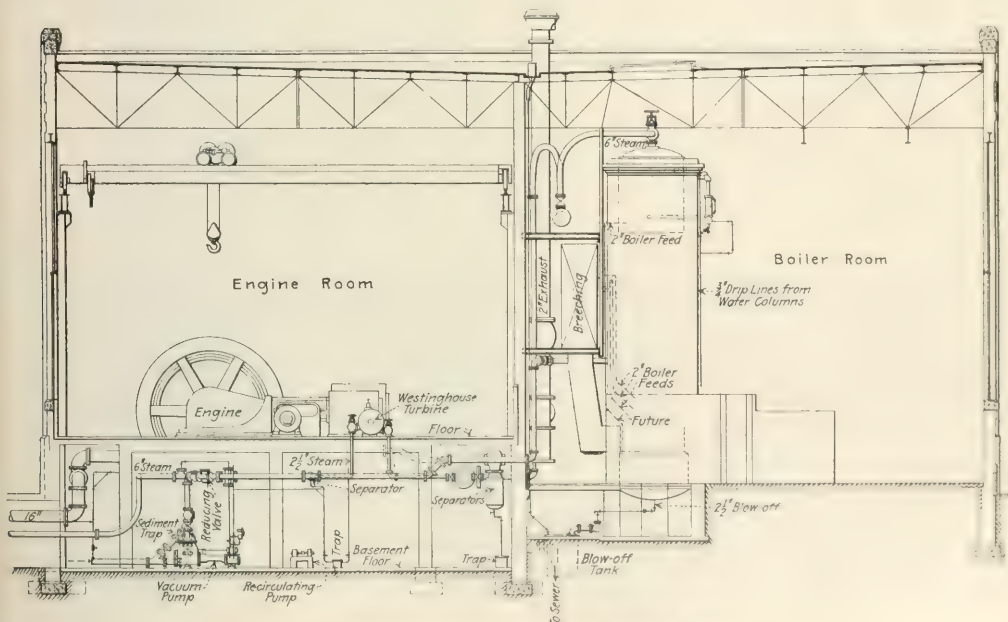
CROSS-SECTIONAL ELEVATION OF POWER HOUSE
